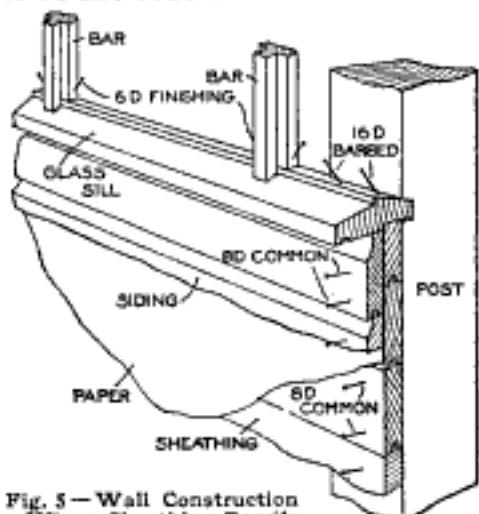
Wall Construction Where Sheathing Boards are Used on the Bottom Part and Glass above the Benches
